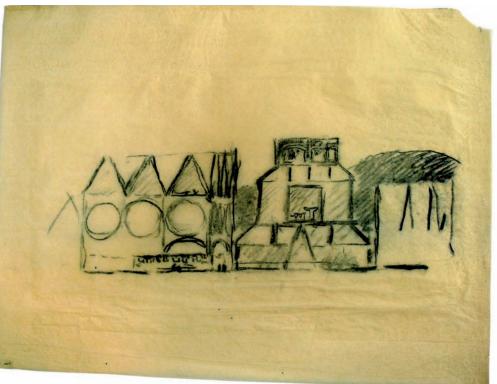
Scheme 3 Elevation Sketch LIK
